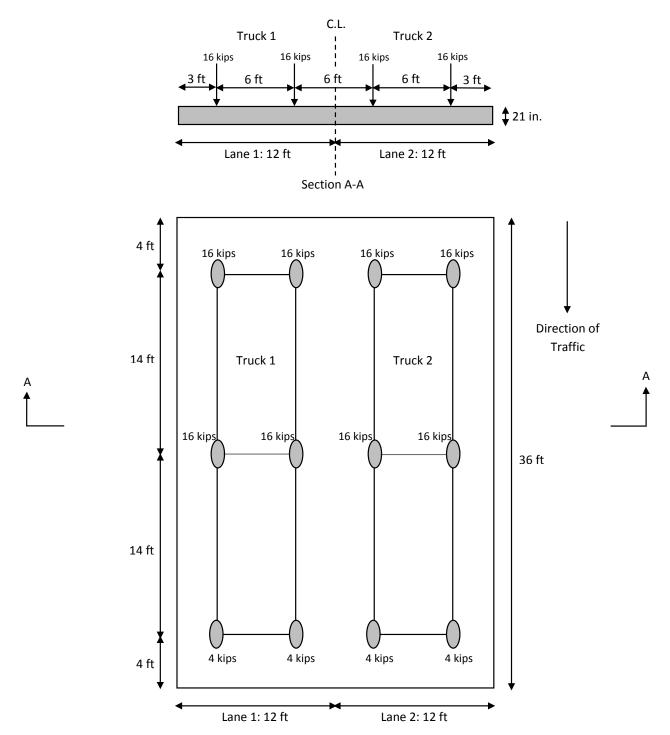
Typical Cross-Section and Plan of Two-Lane 36 ft Span Bridge under Center-Lane Loading Condition.
